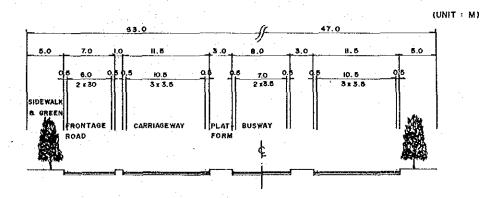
TYPICAL CROSS SECTION OF SECONDARY SYSTEM (1)
